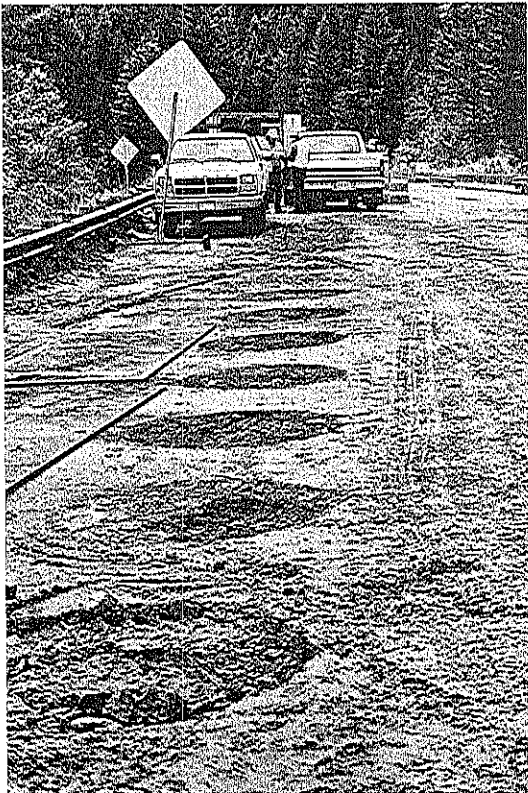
Goat Lick Slide. Line of completed lean concrete (lagging) piles (Photo: July 21, 1993).
